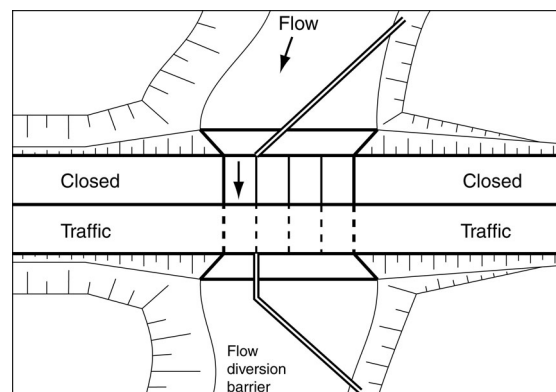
Stage 3: Relocate traffic and final culvert construction
